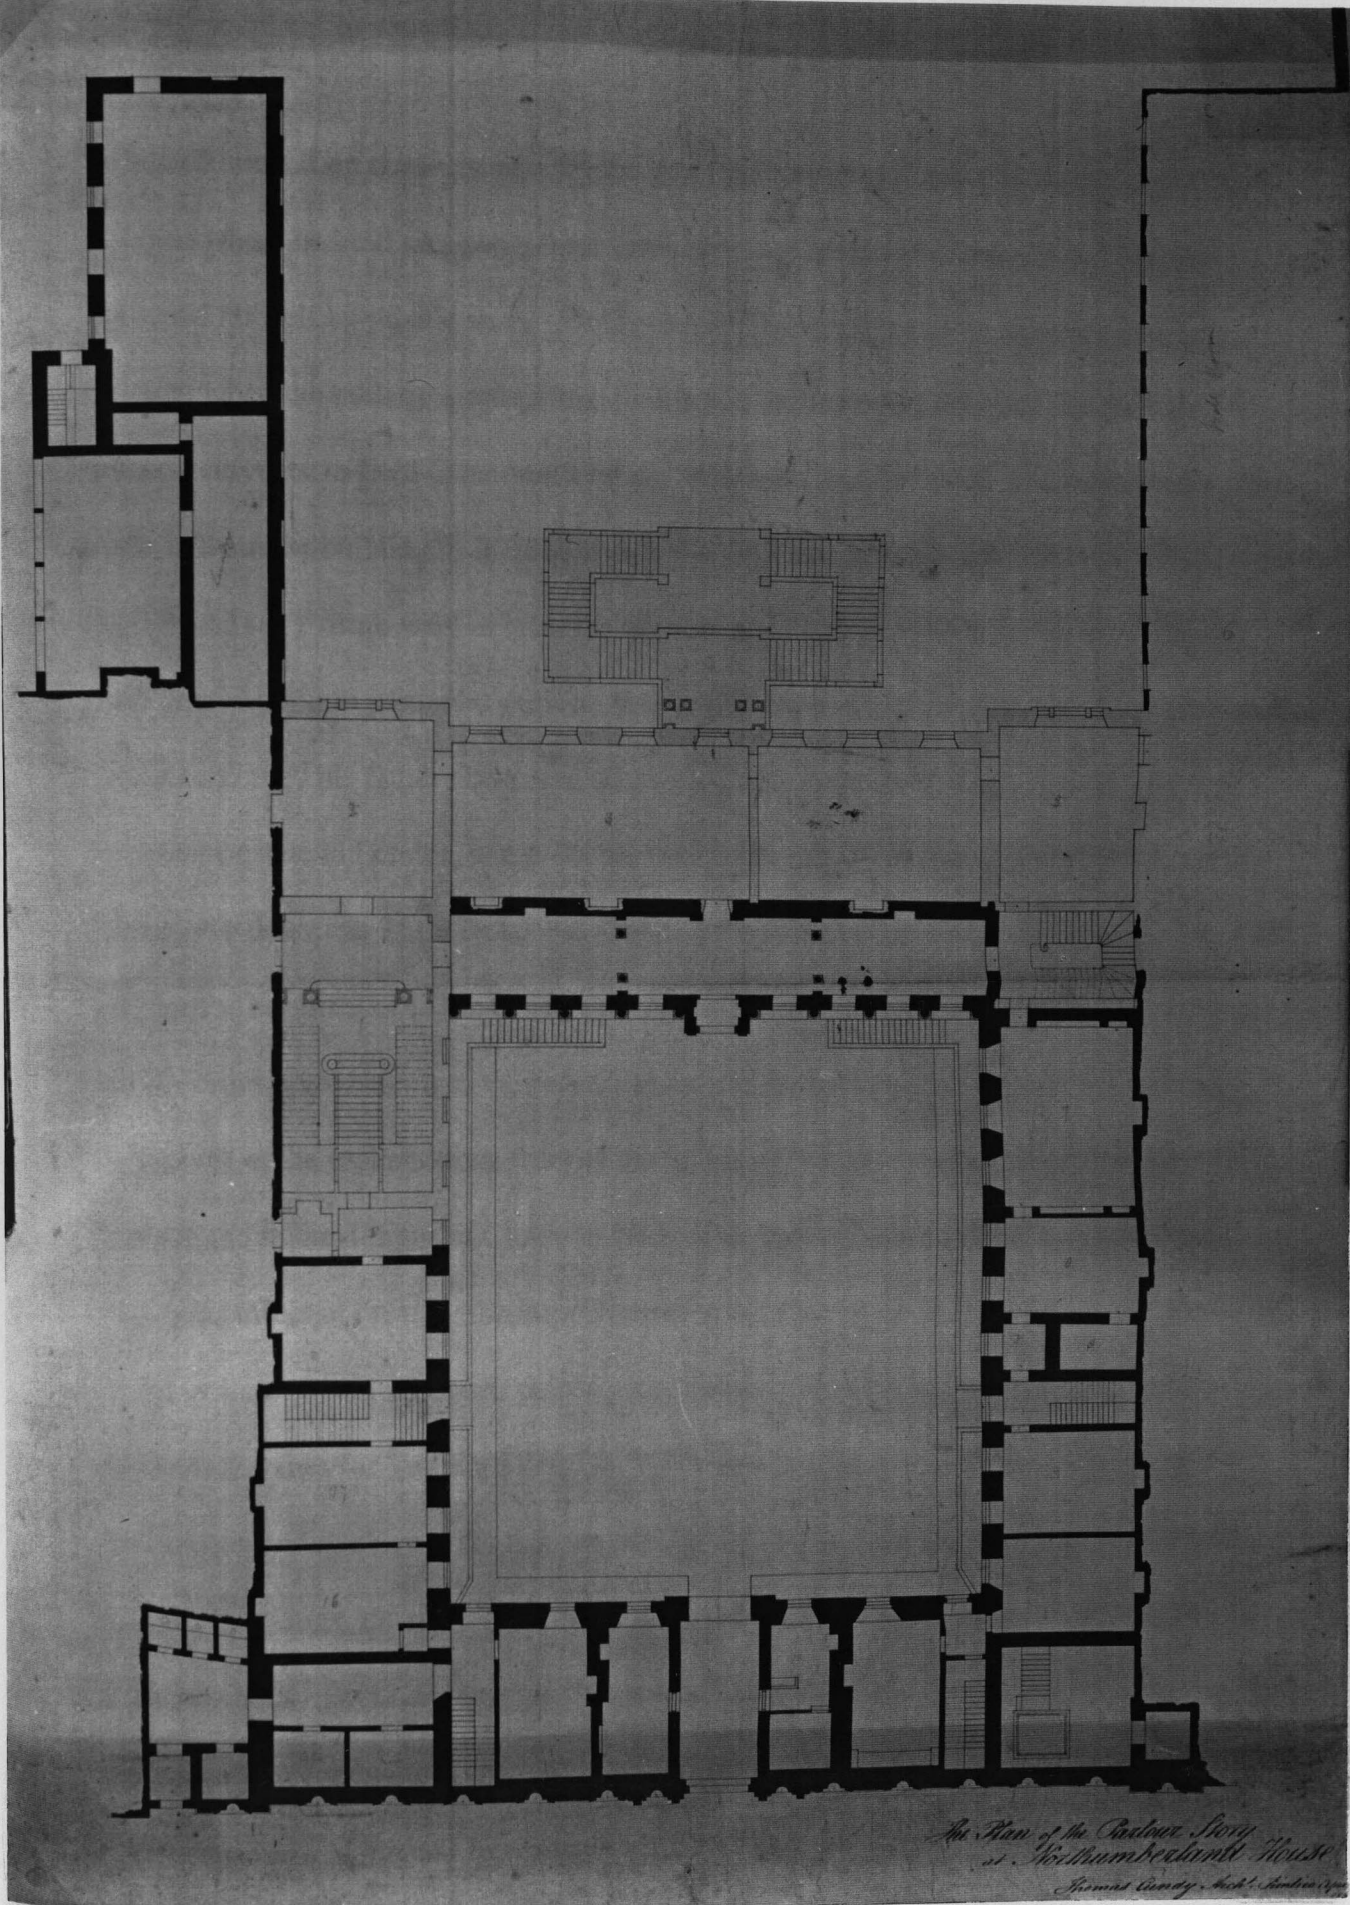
Plate VII Plan of the ground floor showing Thomas Cundy's proposal for alterations to the south side including the two new staircases, April 1821.
